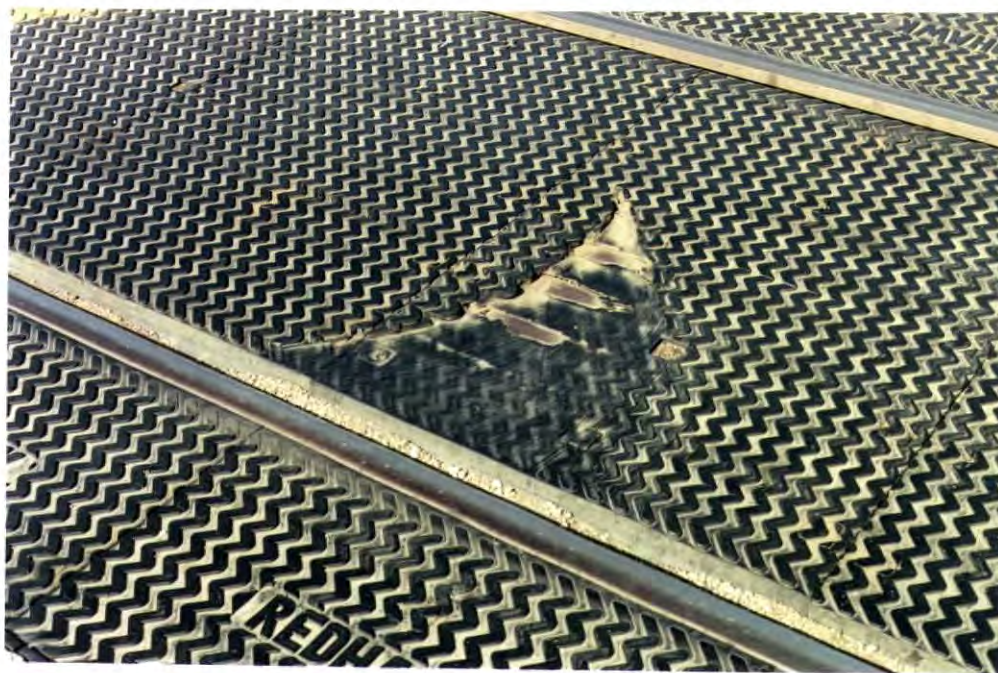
US Highway 14 at Blunt - Snowplow Damage, Rubber Torn Off Down to the Steel
